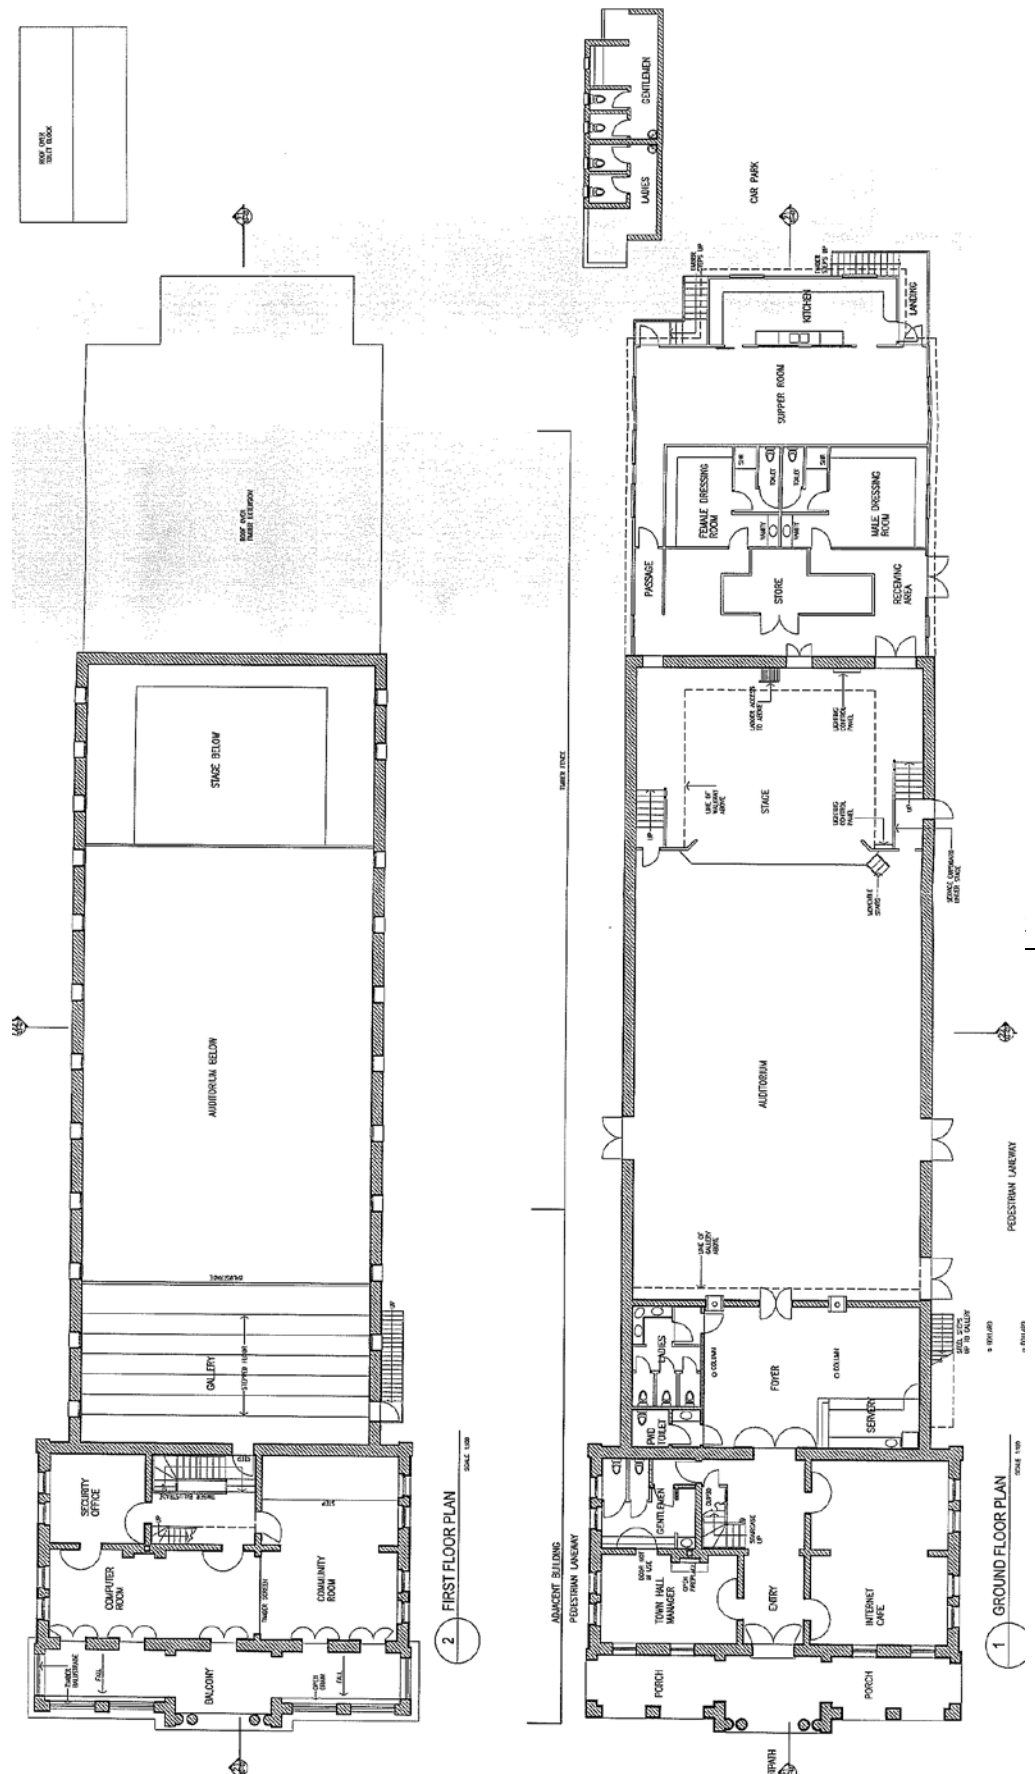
Floor Plan of Warwick Town Hall. Note that some uses of space have changed slightly with no major structural changes. Courtesy SDRC.
